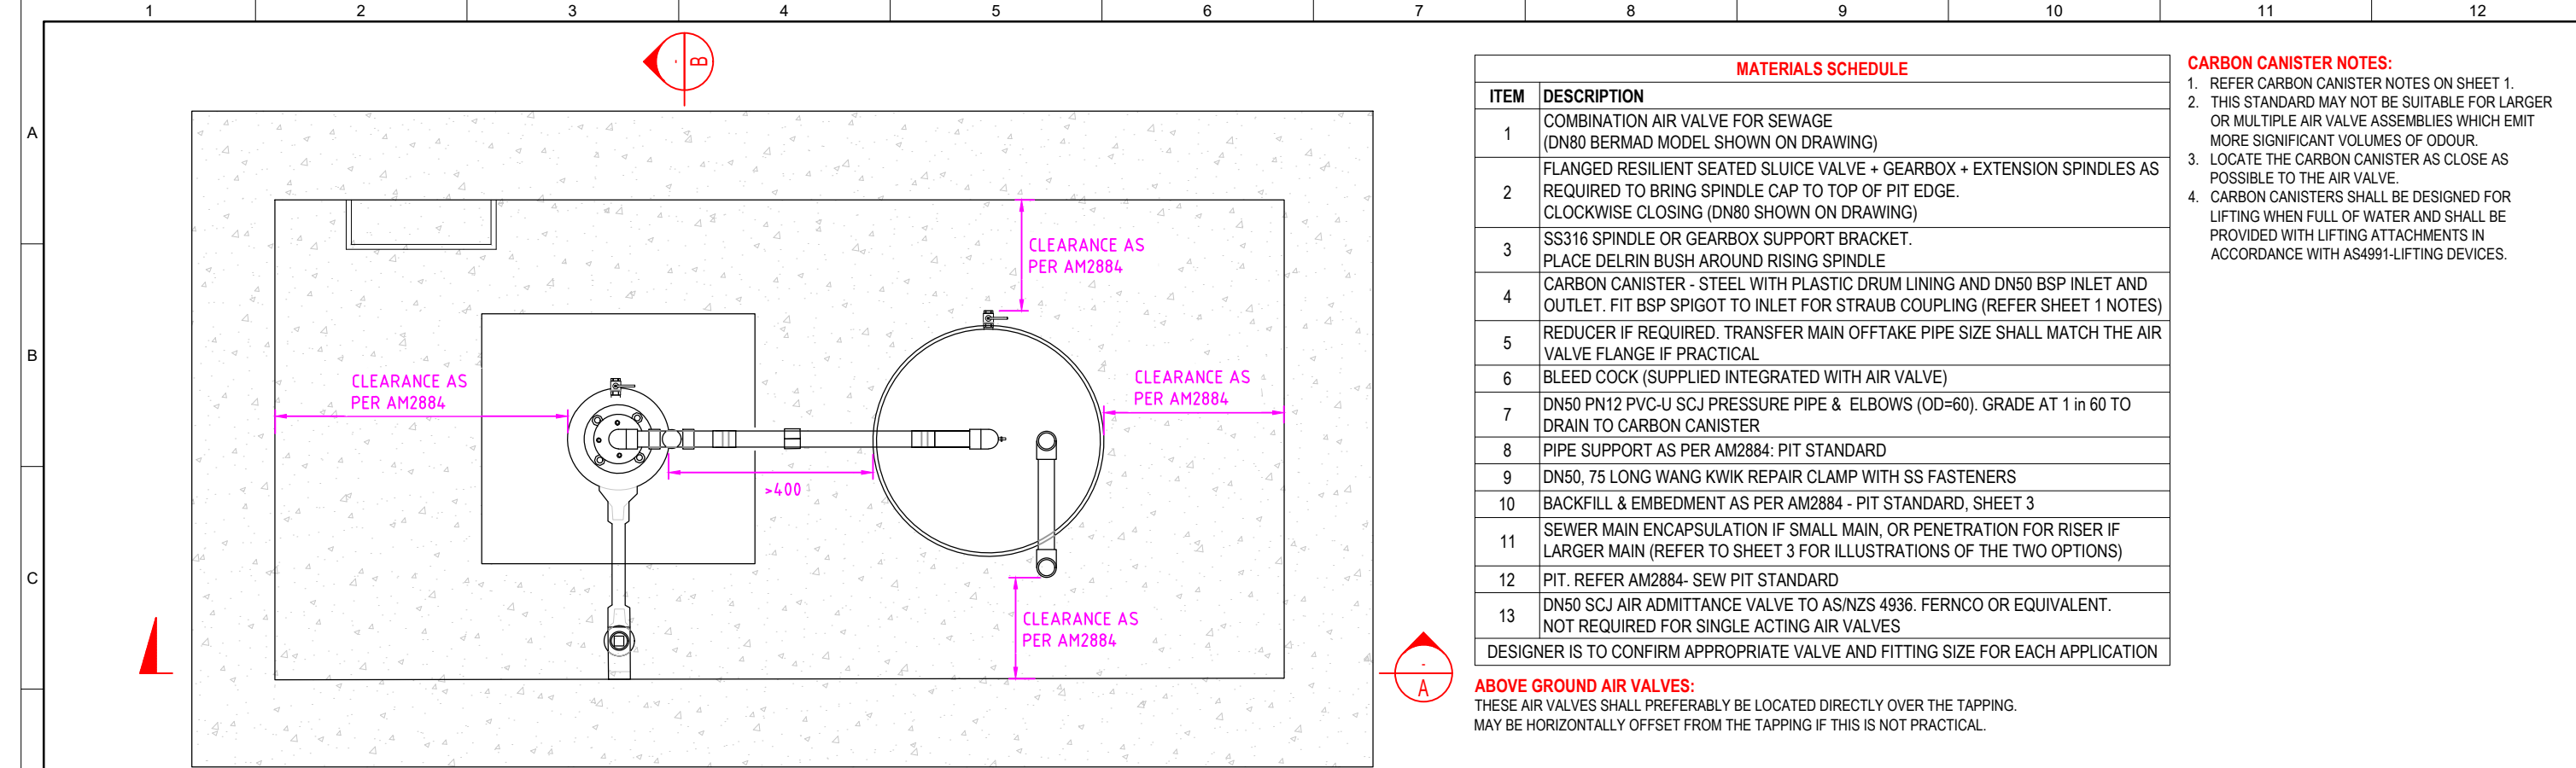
BELOW GROUND AIR VALVE AND CARBON CANISTER ASSEMBLY
